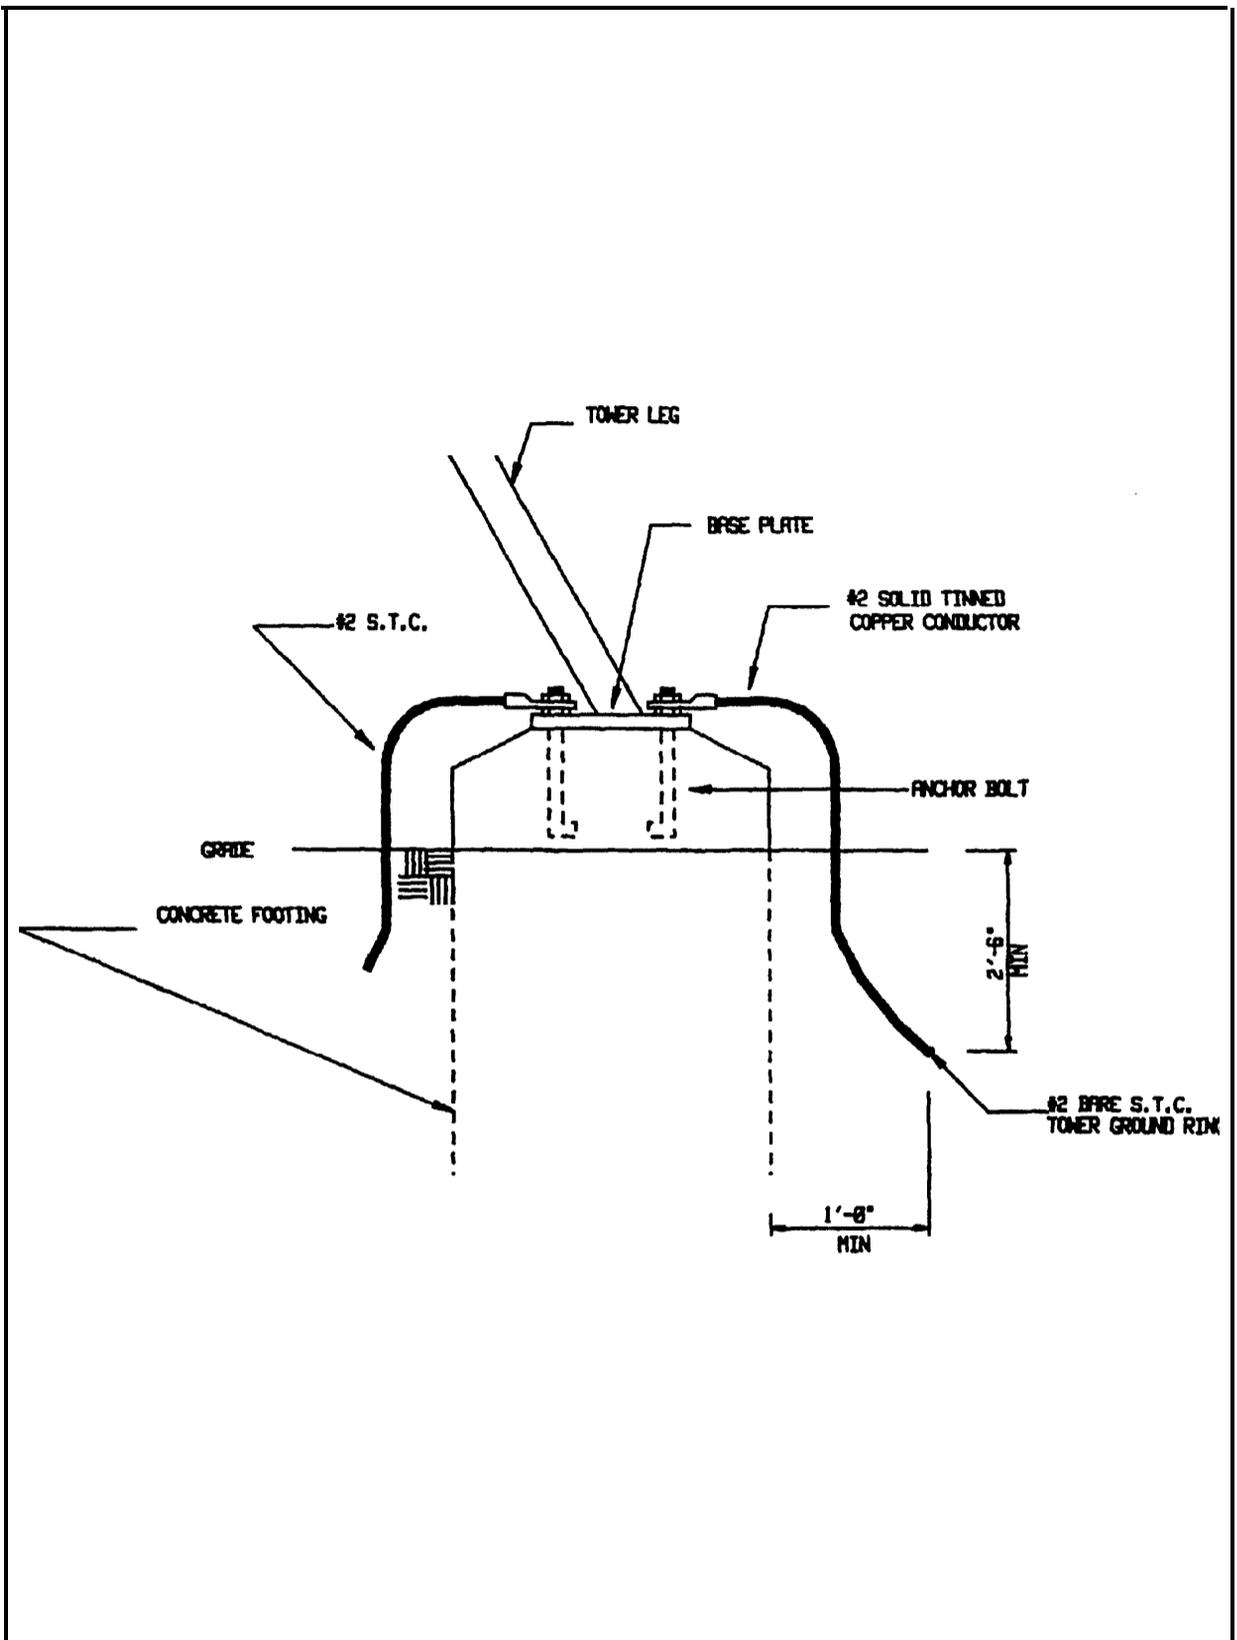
Radio Station Grounding Self-Supporting Tower Footing Detail
